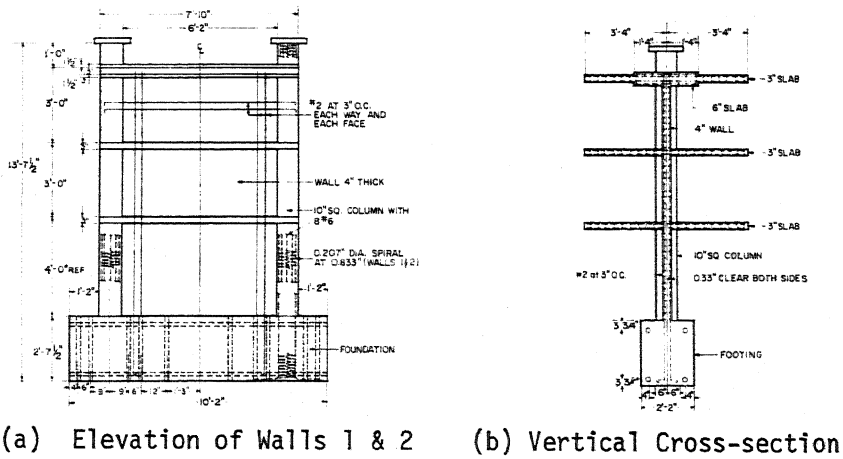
DIMENSIONS AND DETAILS OF WALL SPECIMENS
